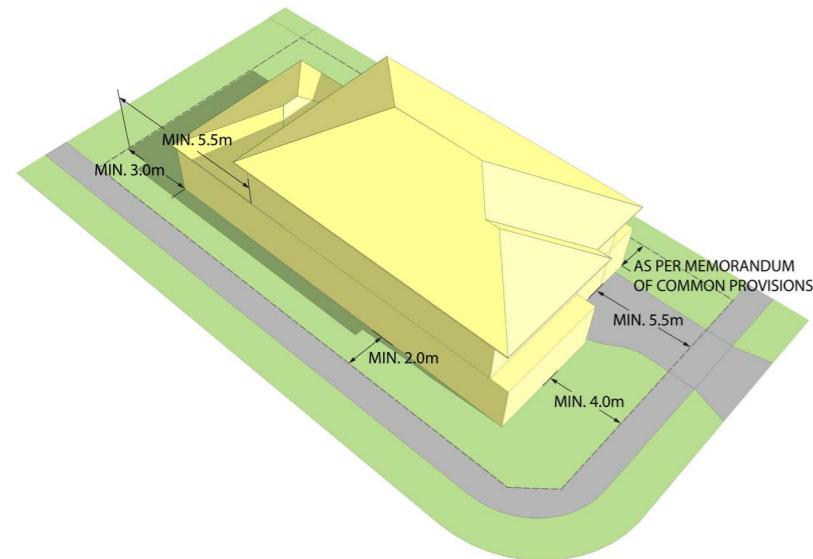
Typical minimum setbacks of houses from lot boundaries on a corner lot.
